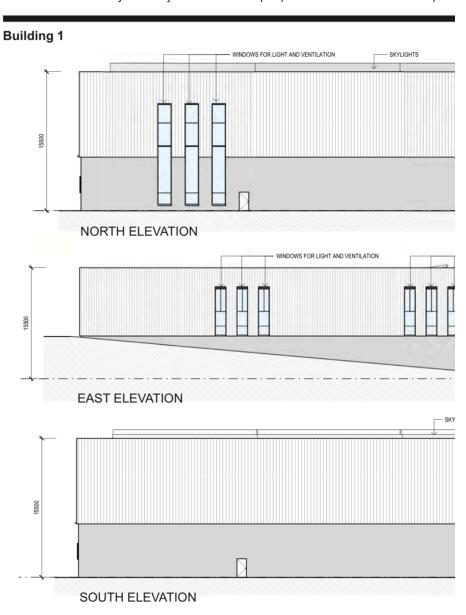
Architectural Elevation drawings from ADR Appendix J - Architectural Plans 26 September 2023. Fairly conceptual early elevations, showing Building 1 as our example.
